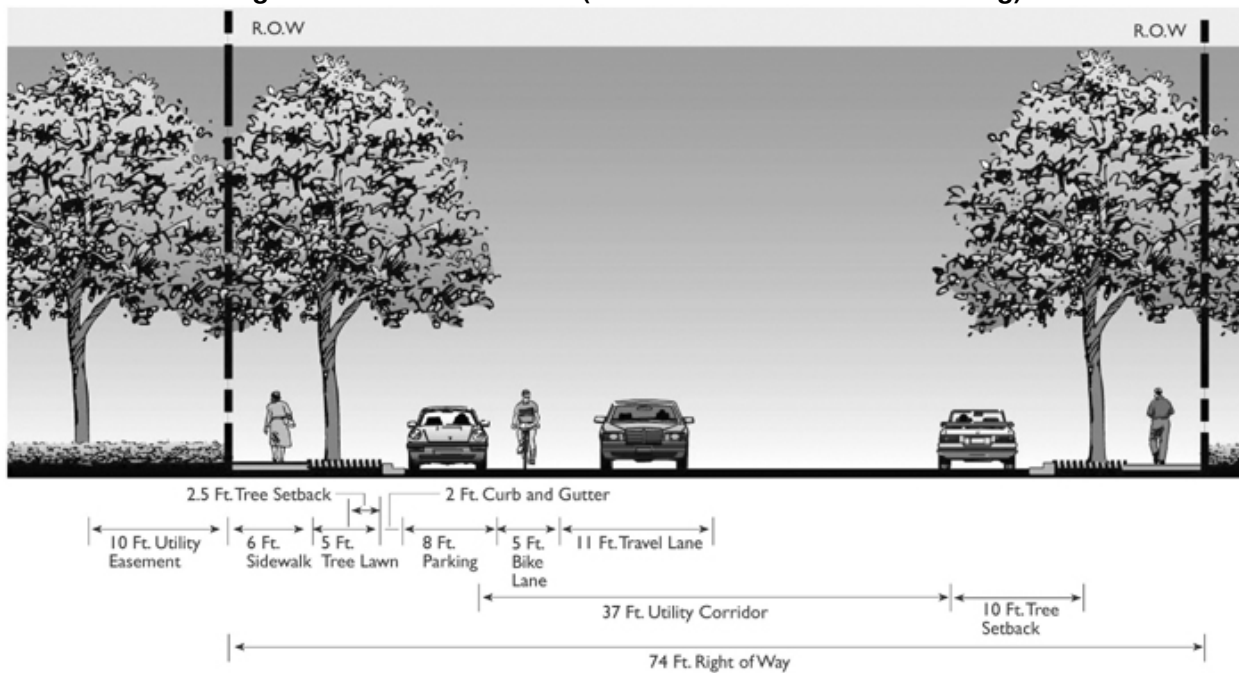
F.2.A-14 - TDD U/S (Collector: With On-Street Parking)
